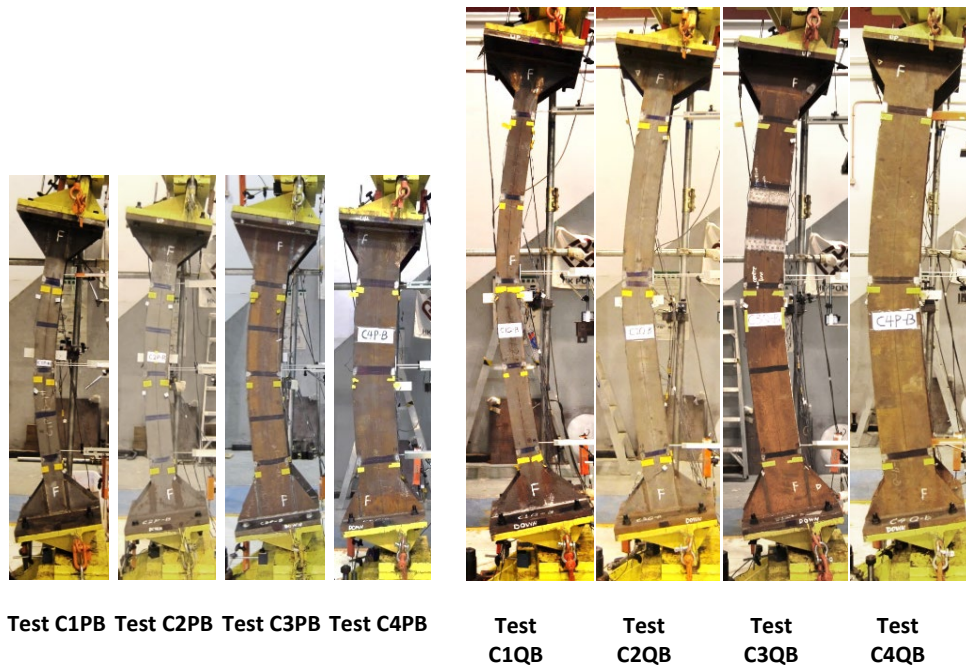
Slender columns of S690 welded H-sections under combined compression and bending
